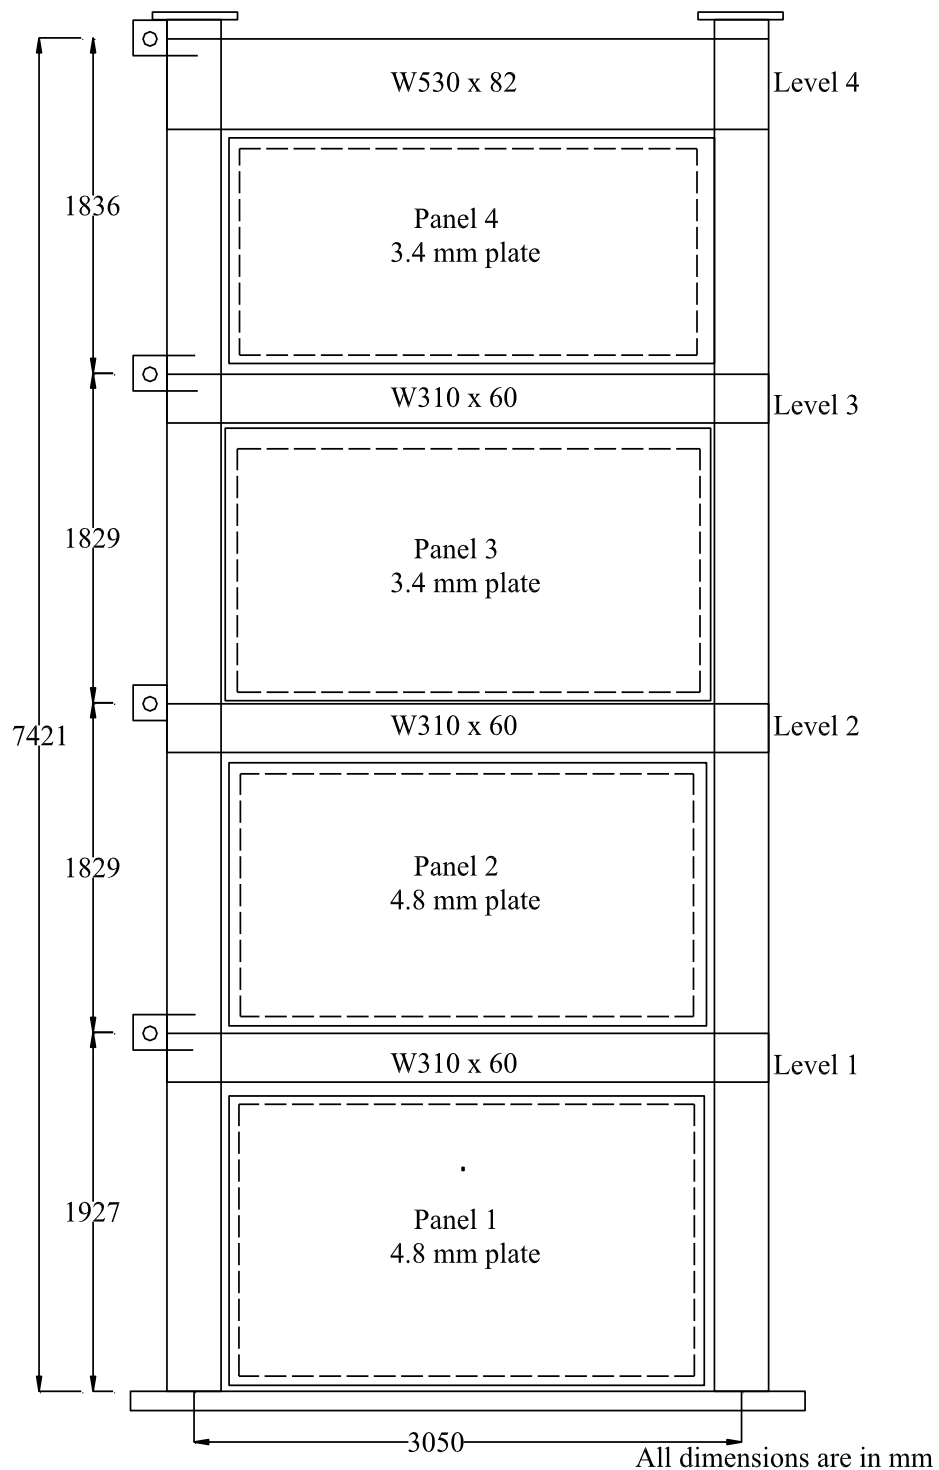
Details of steel plate wall specimen tested by Driver *et al.* (1998)
